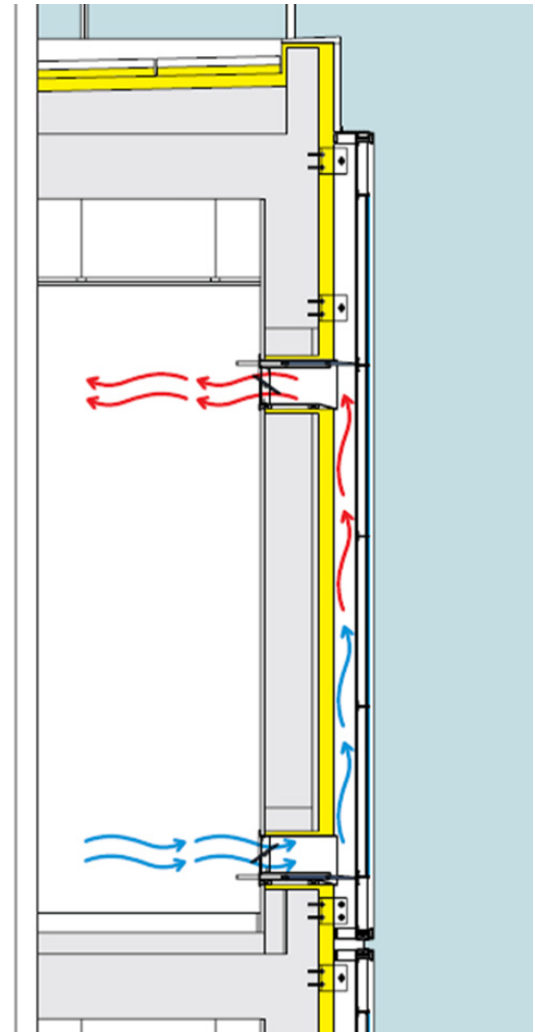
BIPV-T and Windows shading. BIPV-T scheme.
